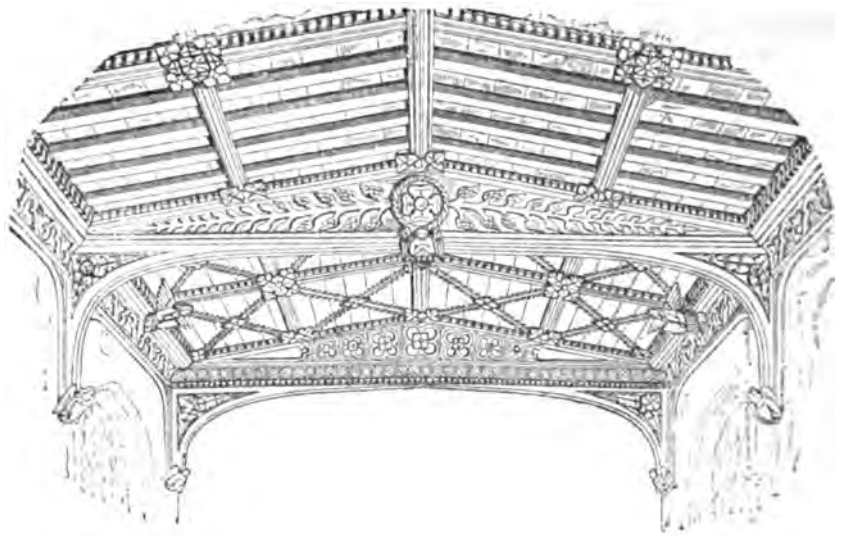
Roof over North Chapel, Wellingborough Church, Northamptonshire.
